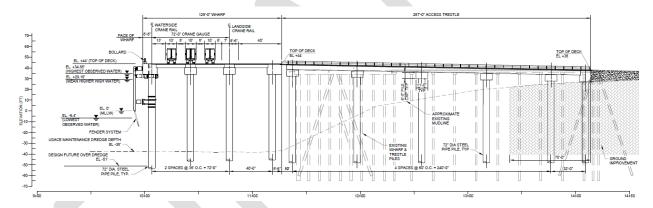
Longitudinal Elevation for T1 Access Trestles: Alternative 2A with 72-inch-diameter Driven Piles
